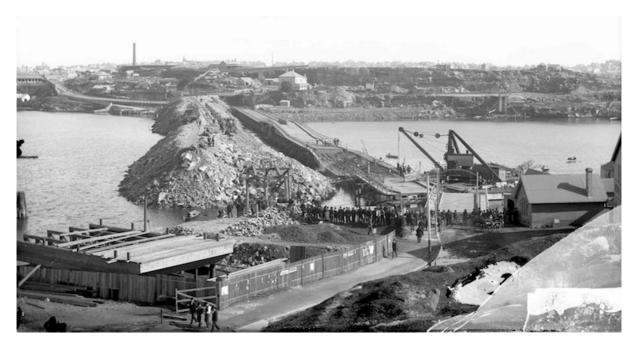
View towards Blackwattle Bay showing the partially collapsed First Glebe Island Bridge, and mid-construction of the Second Glebe Island Bridge, 1899. (Source: https://pyrmonthistory.net.au/locations-gallery)
